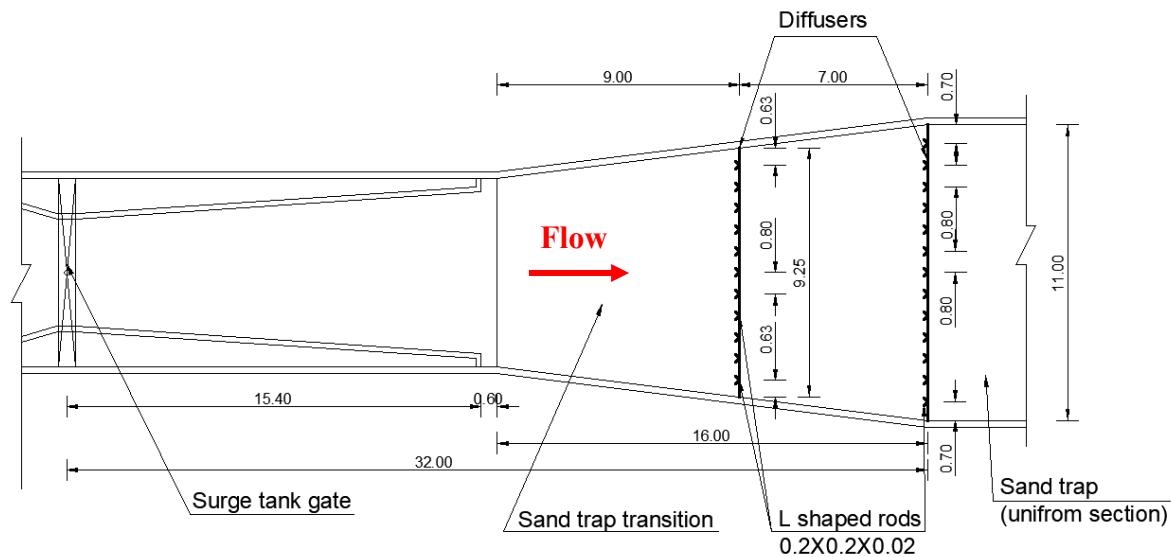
Drawing showing the plan view of the sand trap with the placement of the flow calming structures
